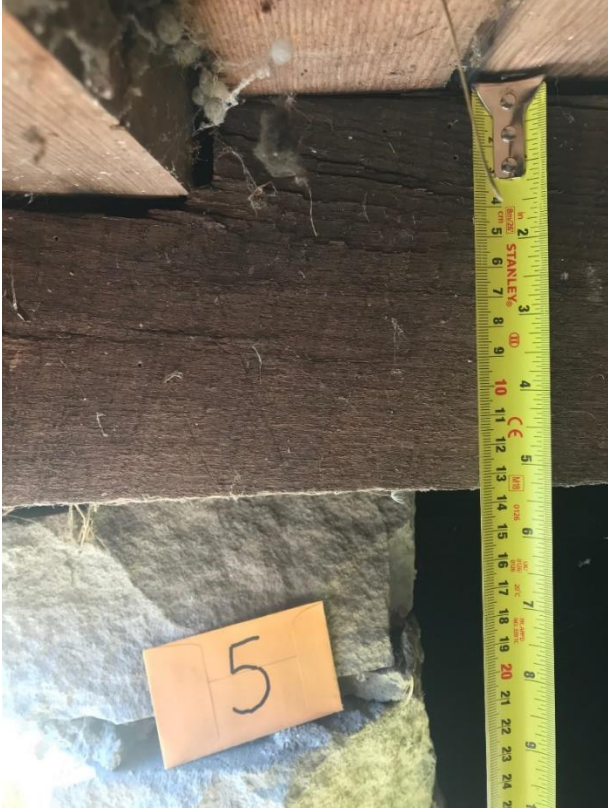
The floor box 28' x 28' +/- . The center floor beam, which is 8" wide and 6" deep, runs east to west. The center floor beam is 8" wide and 6" deep, running East to West and the floor joists rest on top of it. It is a salvage beam with various notches and cut out areas from a previous use. It is inadequately supported by metal post of limestone block without any proper footing. The floor framing is wildly underbuilt. Currently the floors could not support any heavy furniture, such my piano and breakfront, which I plan to move there.
